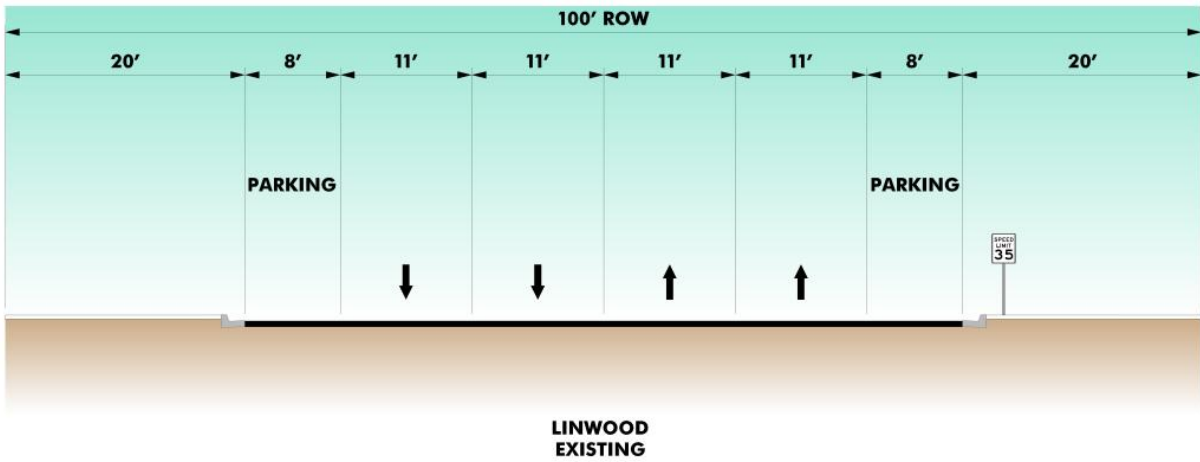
Bus Rapid Transit Linwood Blvd Typical Section, Existing Conditions
